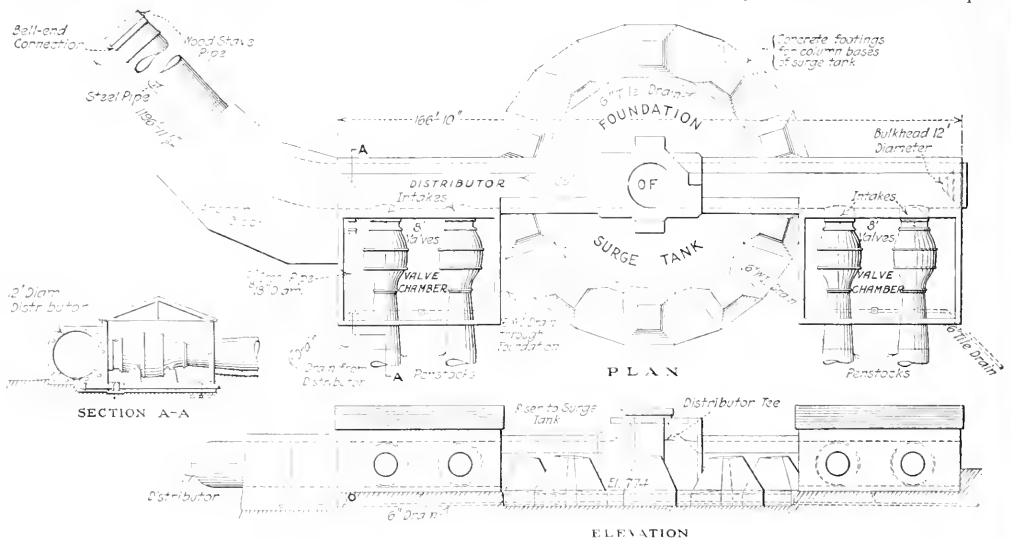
PLAN AND ELEVATION OF THE 12-FT. DISTRIBUTOR
